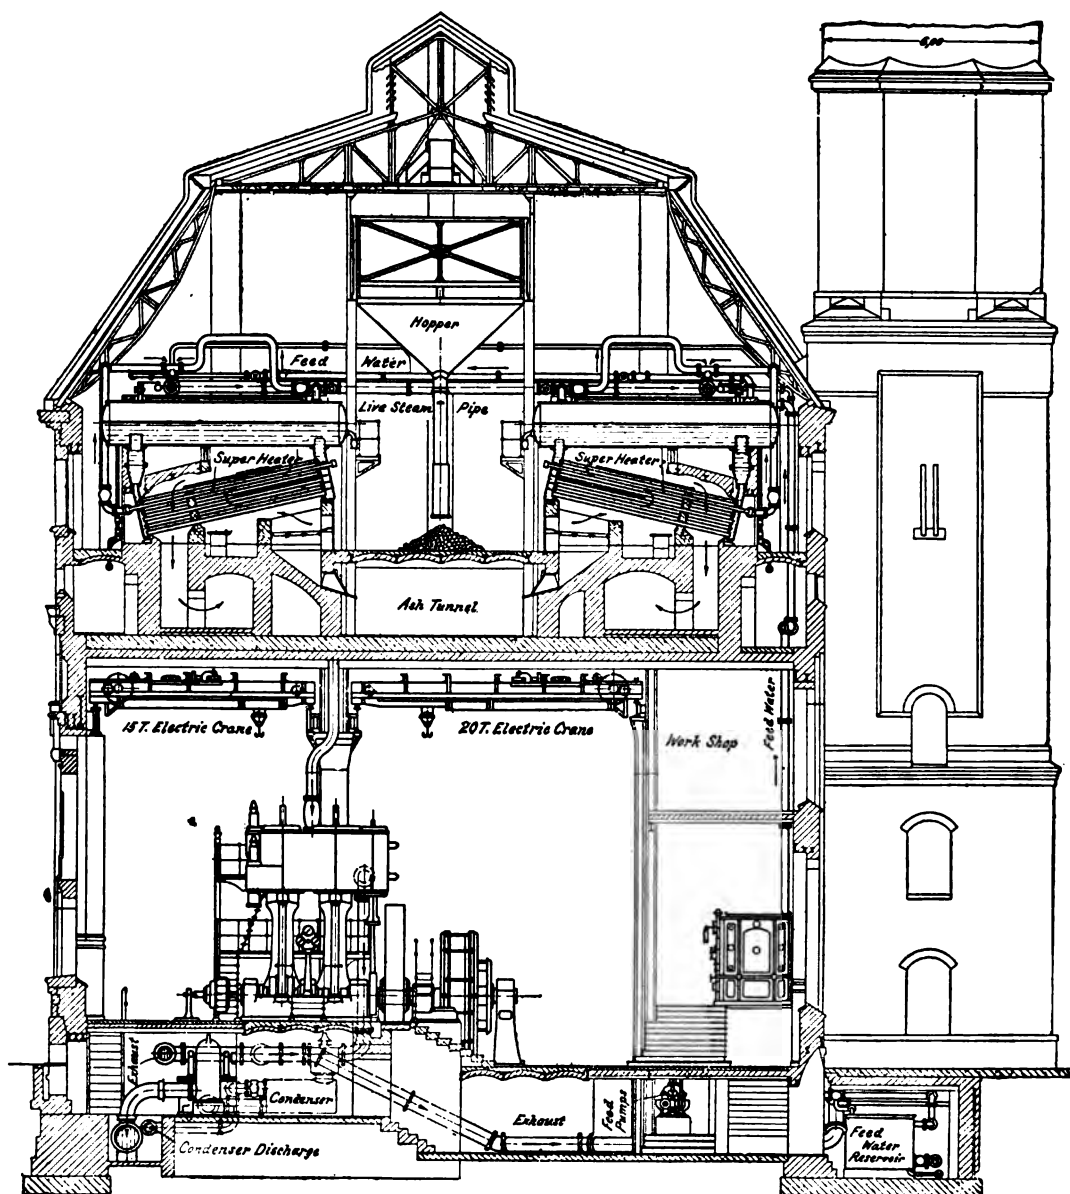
Trebbiner St. Plant of the Elevated R.R., Berlin (*Power*).
